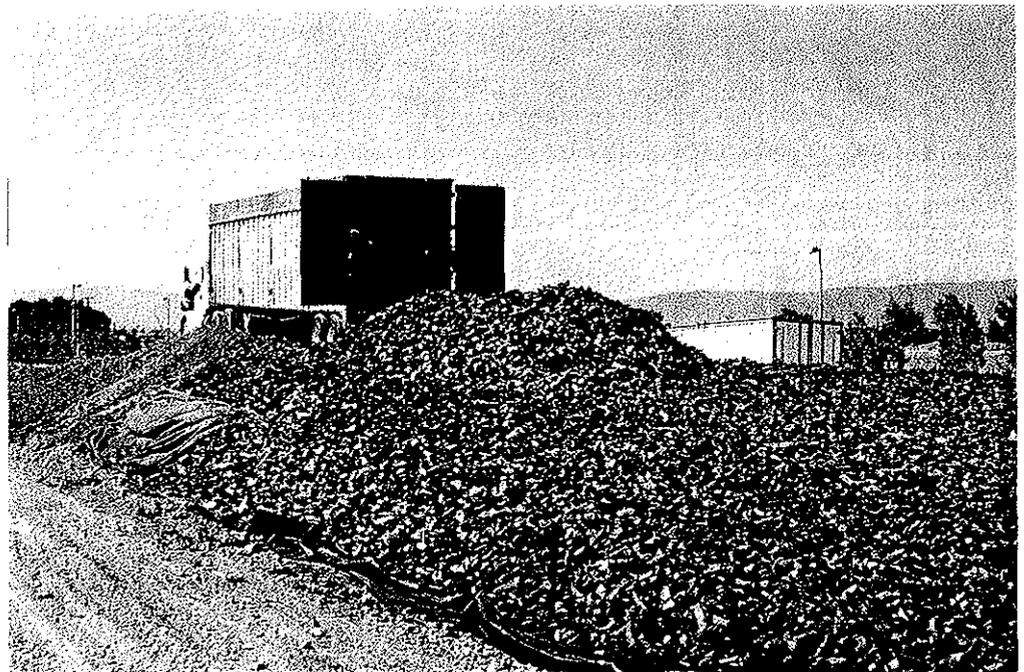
Unloading tire shreds from walking floor trailer, Dixon Landing Interchange.
